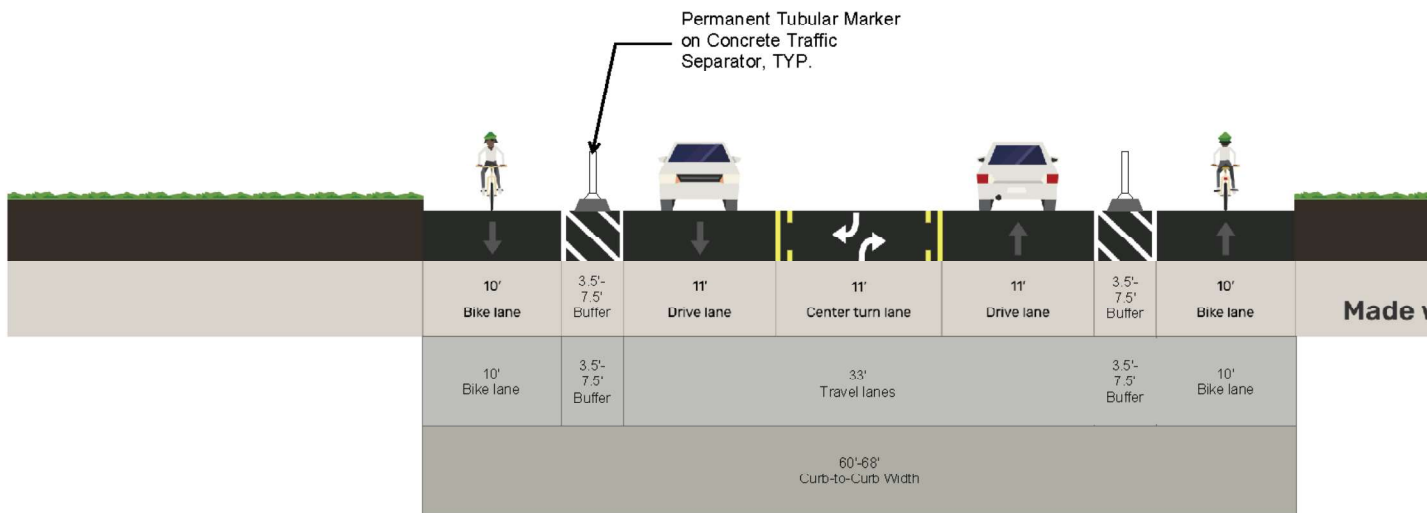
TYPICAL CROSS-SECTION OPTION, 60'-68' CURB-TO-CURB WIDTH (LOOKING EASTBOUND) WITH VERTICAL PROTECTION
